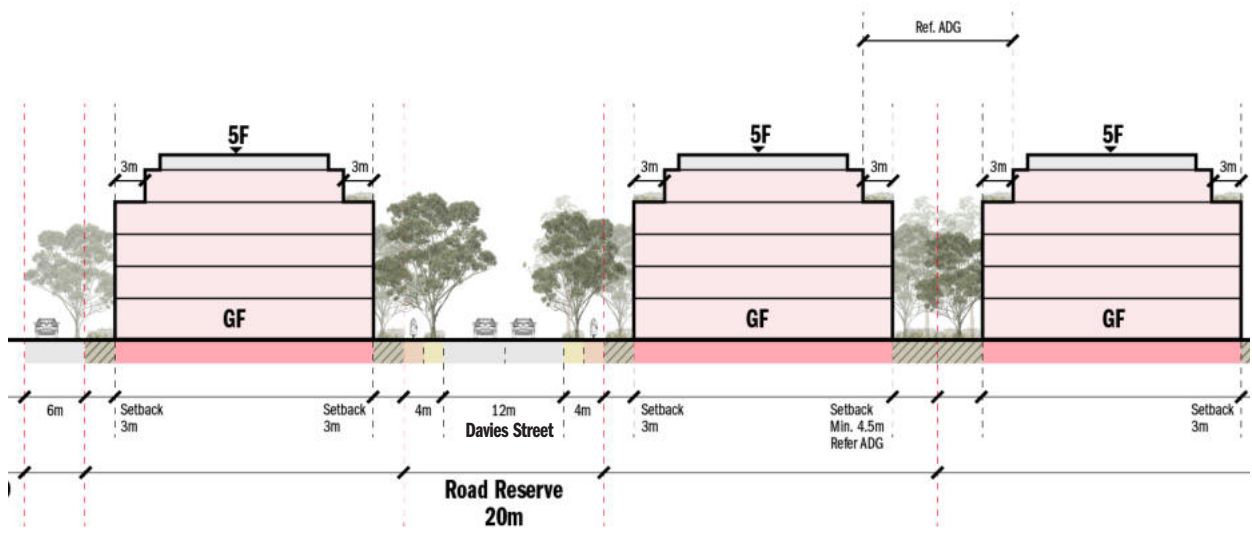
Section 1 - Cross section showing new five storey developments residential developments on either side of Davies Street, Taverners Hill
